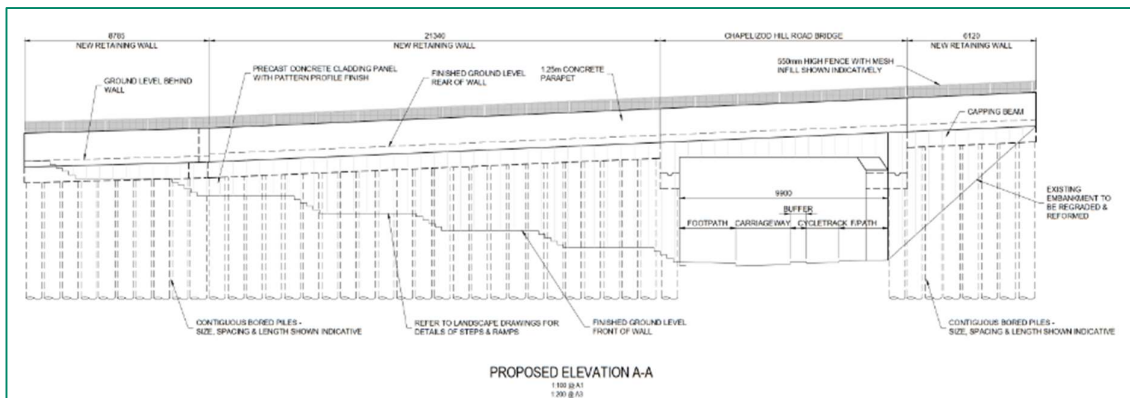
Elevation of Chapelizod Hill Road Retaining Wall
